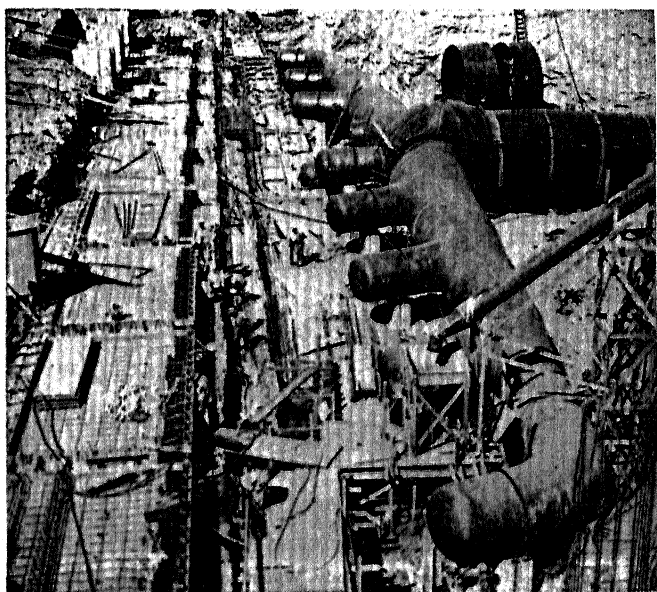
Inlet manifold to one of the pumping stations of a large aqueduct. It is fabricated entirely by arc welding.
